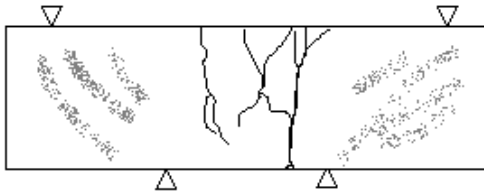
Typical cracking and failure modes for beams reinforced with the Tyfo® glass system for flexure only.
